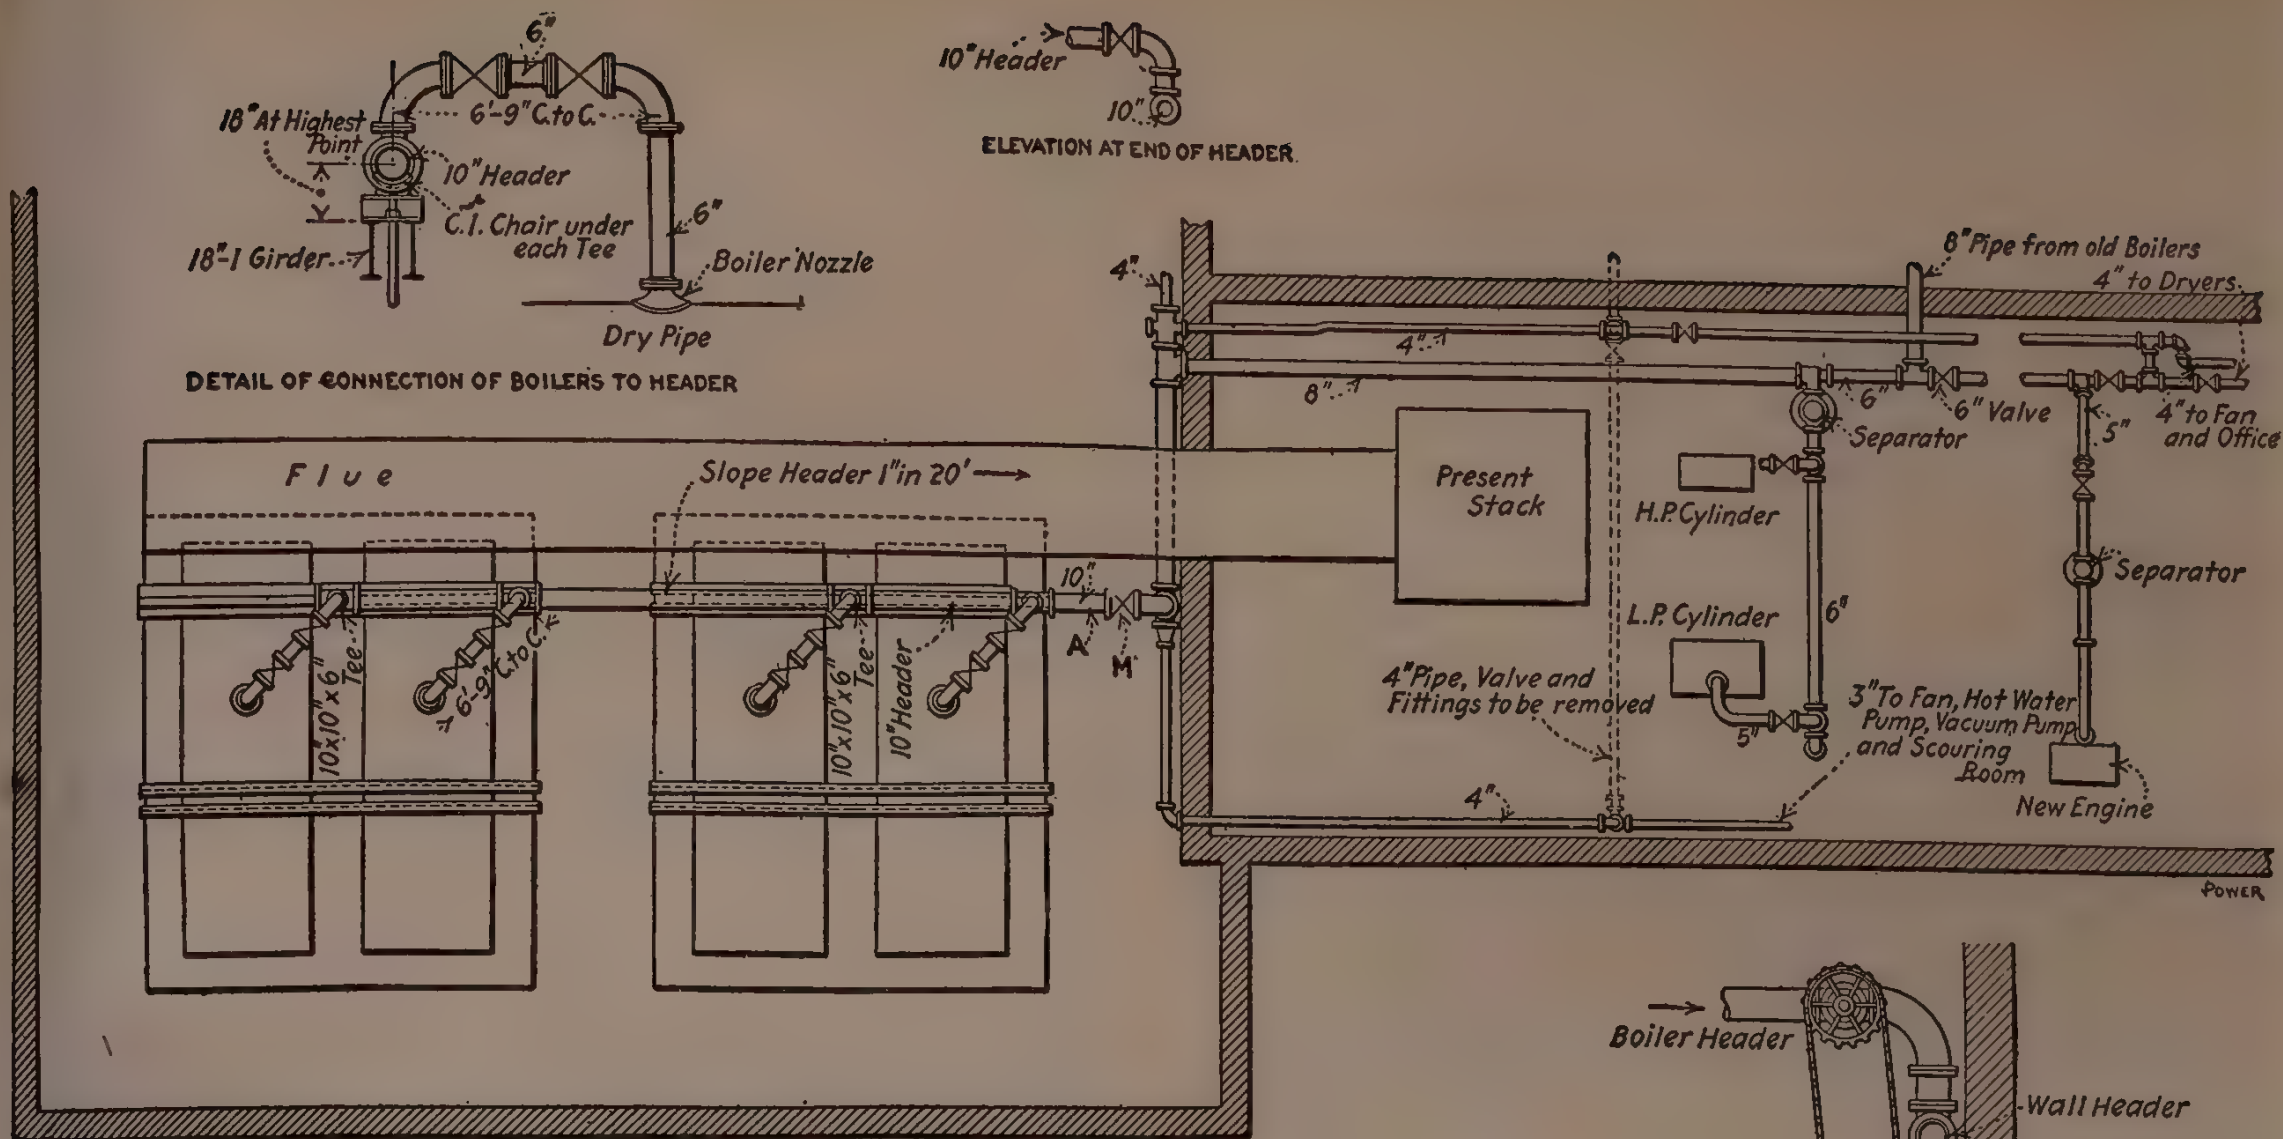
PLAN OF SAFE STEAM PIPING IN A BOILER PLANT
